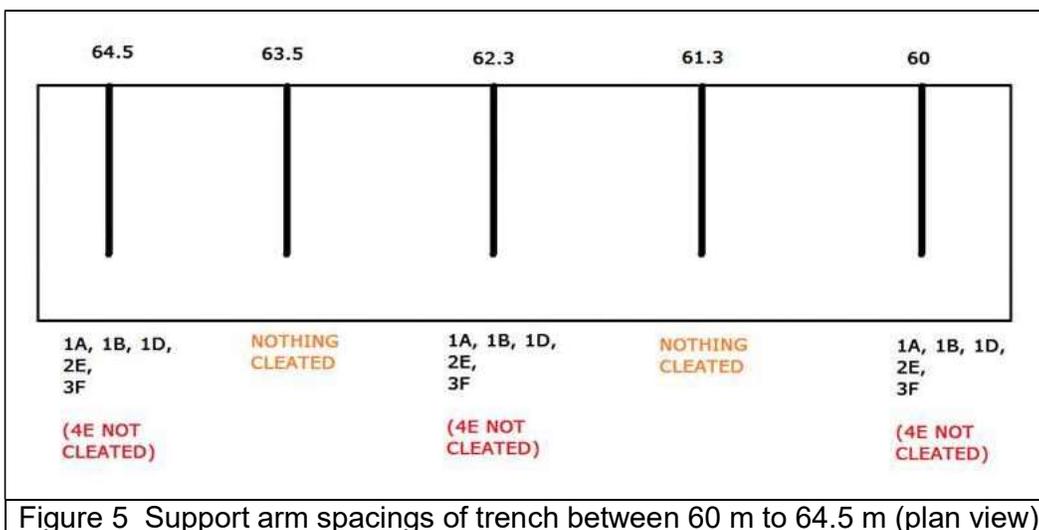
Support arm spacings of trench between 60 m to 64.5 m (plan view)
